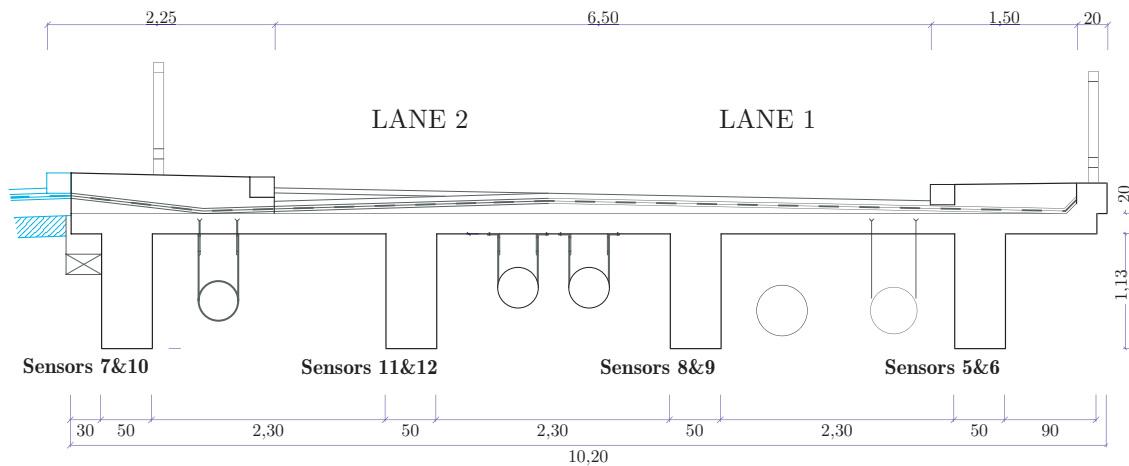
Cross section through Vienna bridge deck indicating the location of the installed strain sensors – dimensions in m and cm (after Haberl 2002).
